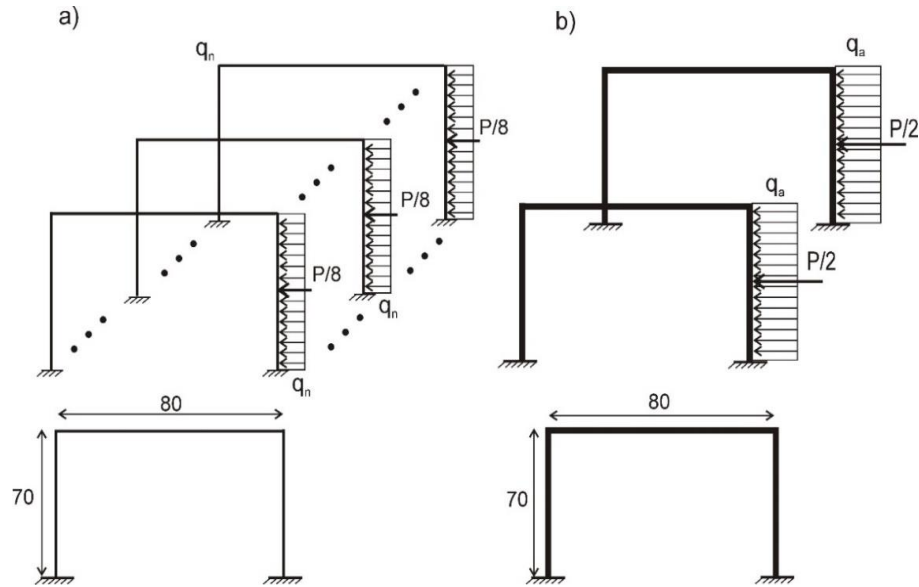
Eight-to-two aggregation of side-loaded portal frames (Π -frames). Dimensions are in millimeters.
